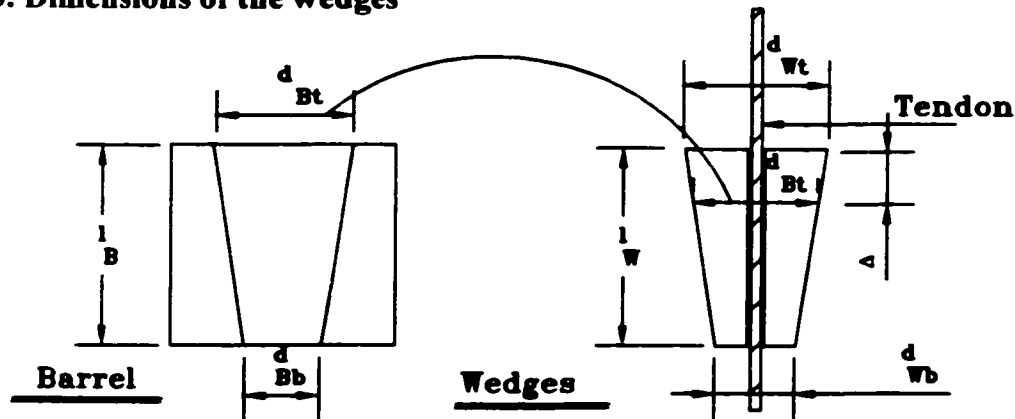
Determination of the wedge dimensions using the barrel dimensions and the seating distance Δ .
